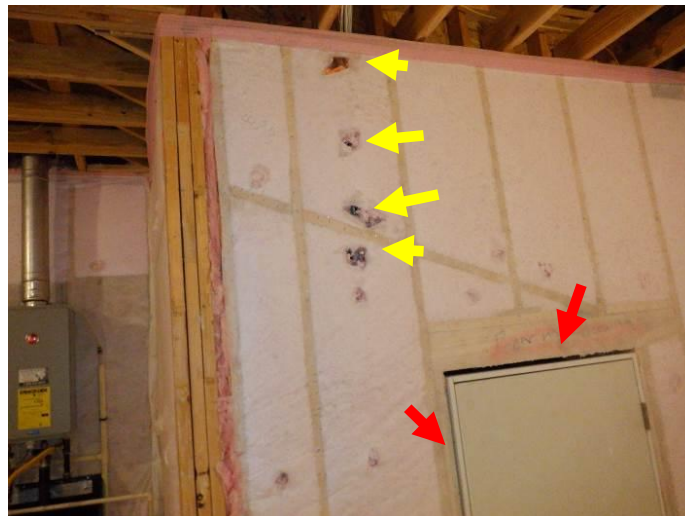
Some holes were noted in the insulation where exposed in the unfinished storage area. The perimeter of the attic access door in the north wall of the unfinished storage room was not adequately insulated (red arrows).
